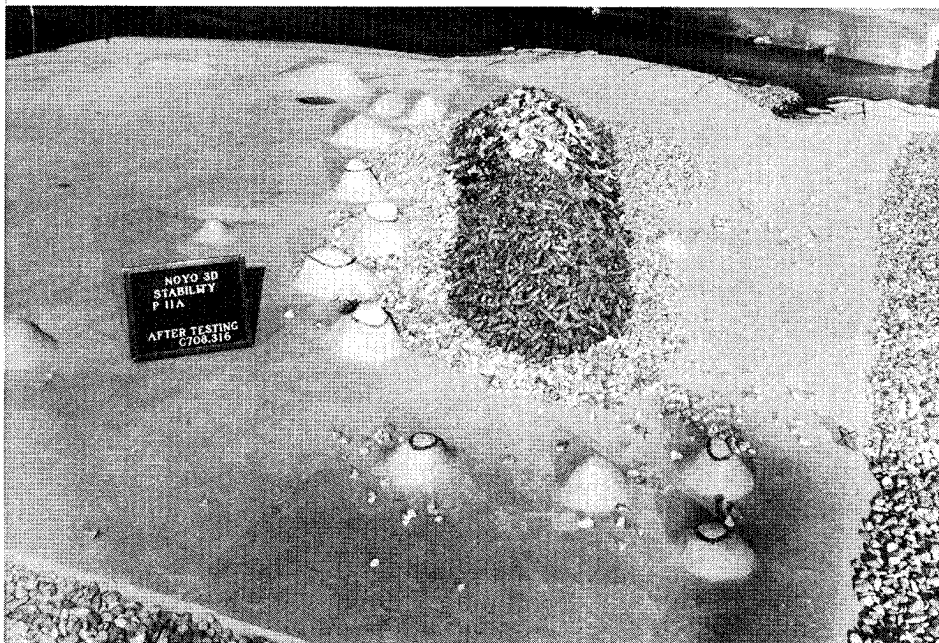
Plan 11, south roundhead after two series of Storm IA waves
